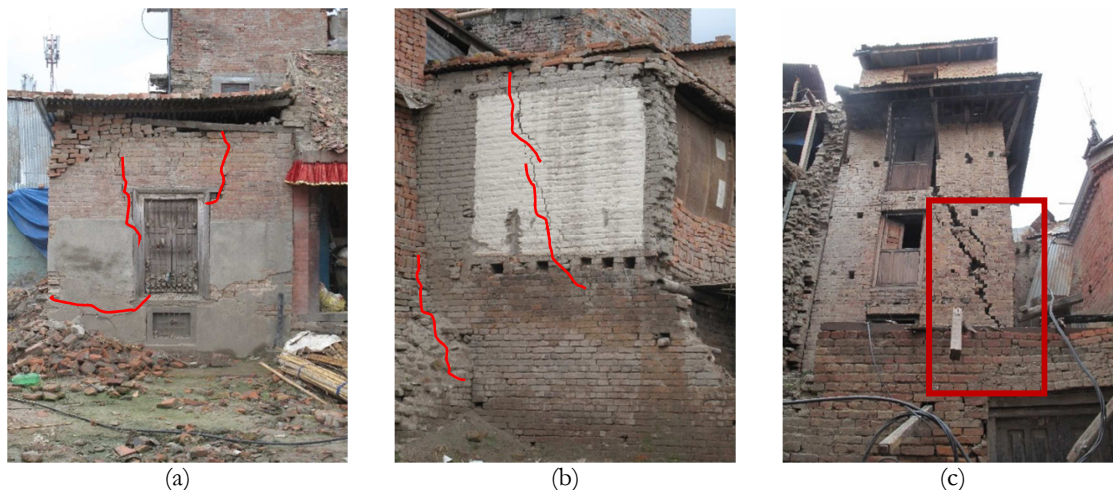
URM earthquake damages and failure modes; (a) Diagonal and upper cracking due to vertical stresses, (b) Diagonal cracking and (c) Diagonal cracking due to the stress accumulation associated with openings
